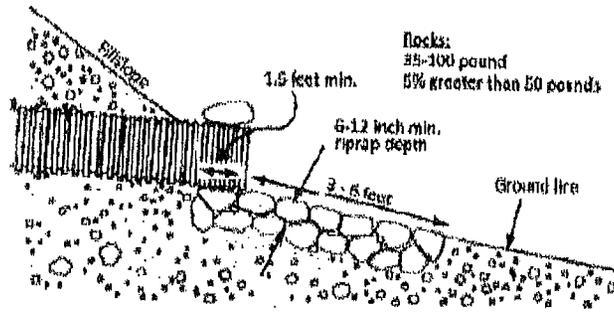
A. Riprap armor at culvert outlet (Modified from: Kellar et al., 2011).
